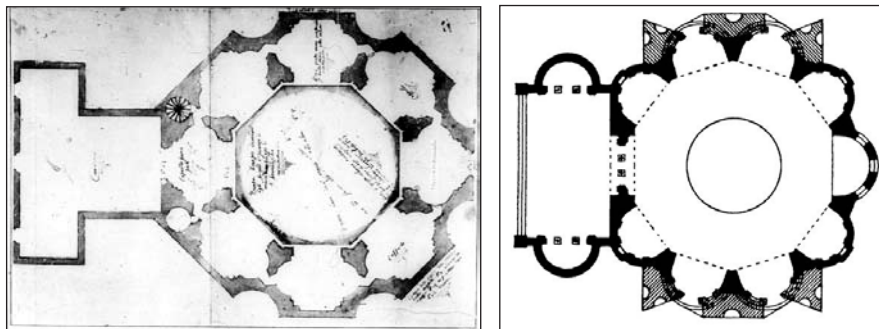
Brunelleschi - Church of Sta Maria degli Angeli - the first true central plan of the 15th century;
